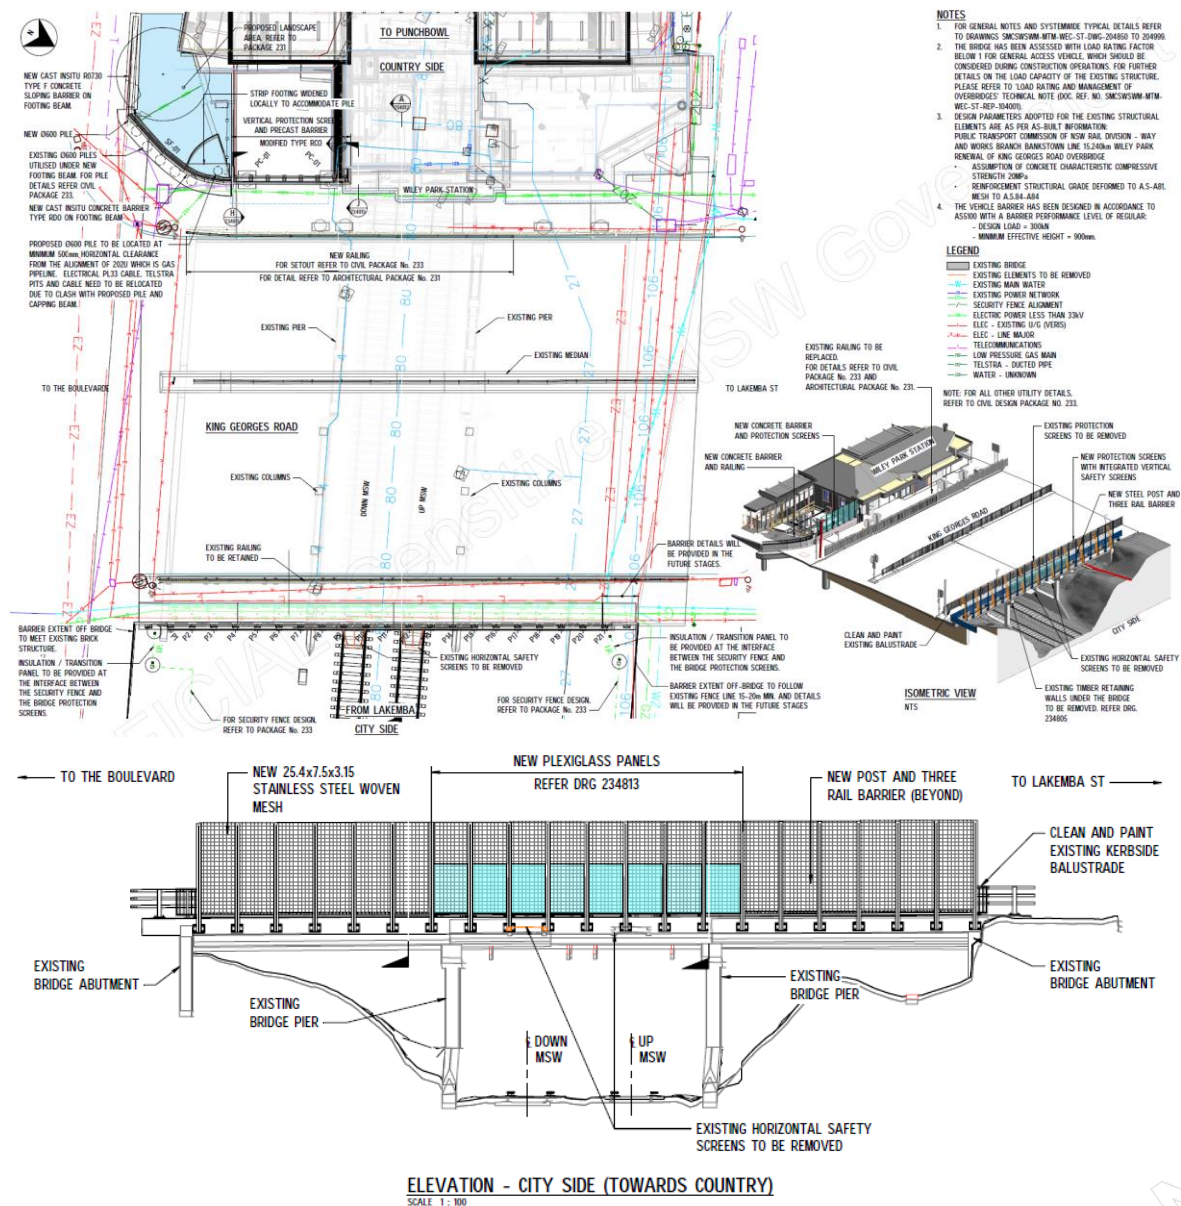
Plans of treatment works for King Georges Road Bridge (Source: Metron T2M 2022, provided by ARCH Artifex)
